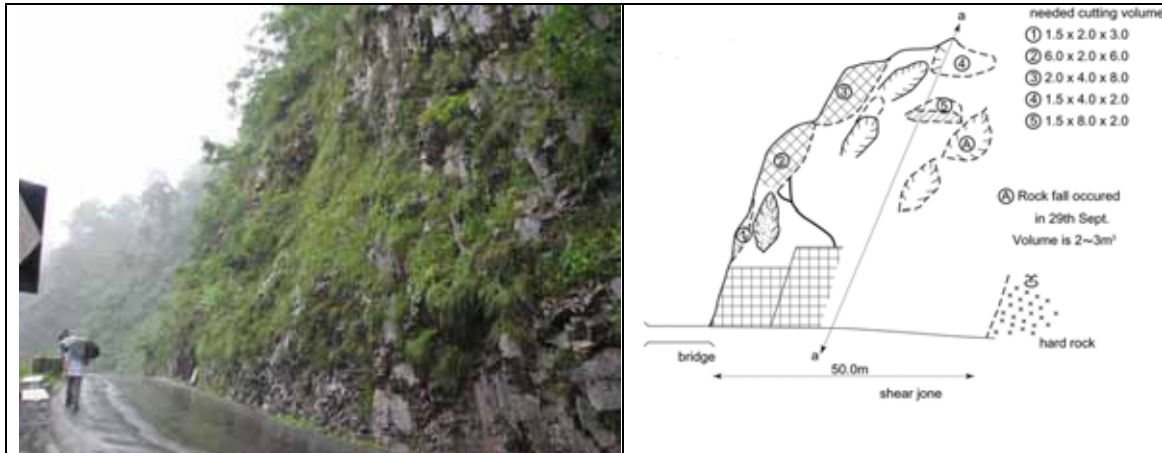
Rock/Rock Mass Failure Prone Section in N-M Highway
